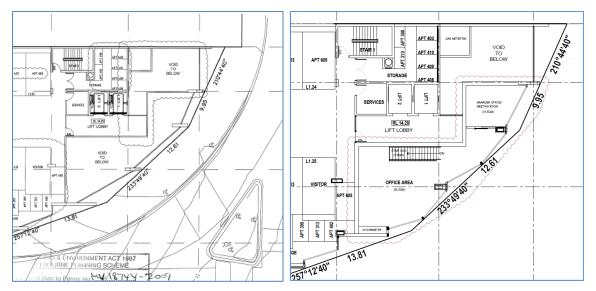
Extract of the endorsed level one floor plan (left) compared to the extract of the proposed level one floor plan (right) (Source: applicant)
